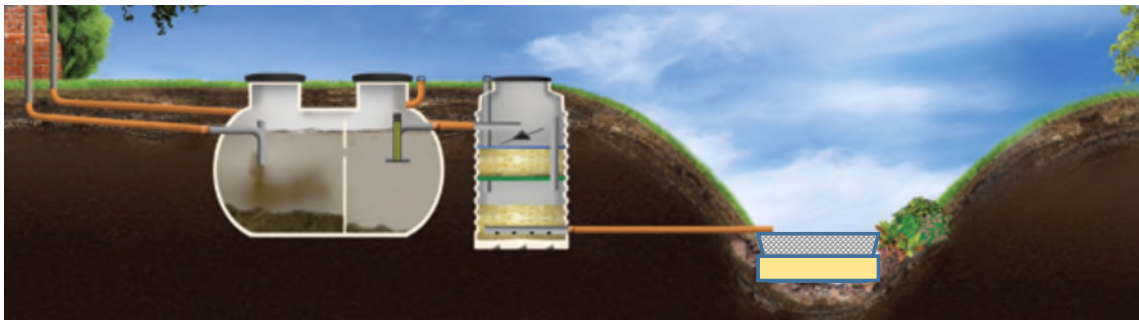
Septic Tank Has Square Base to Assist with Stability – No concrete surround
